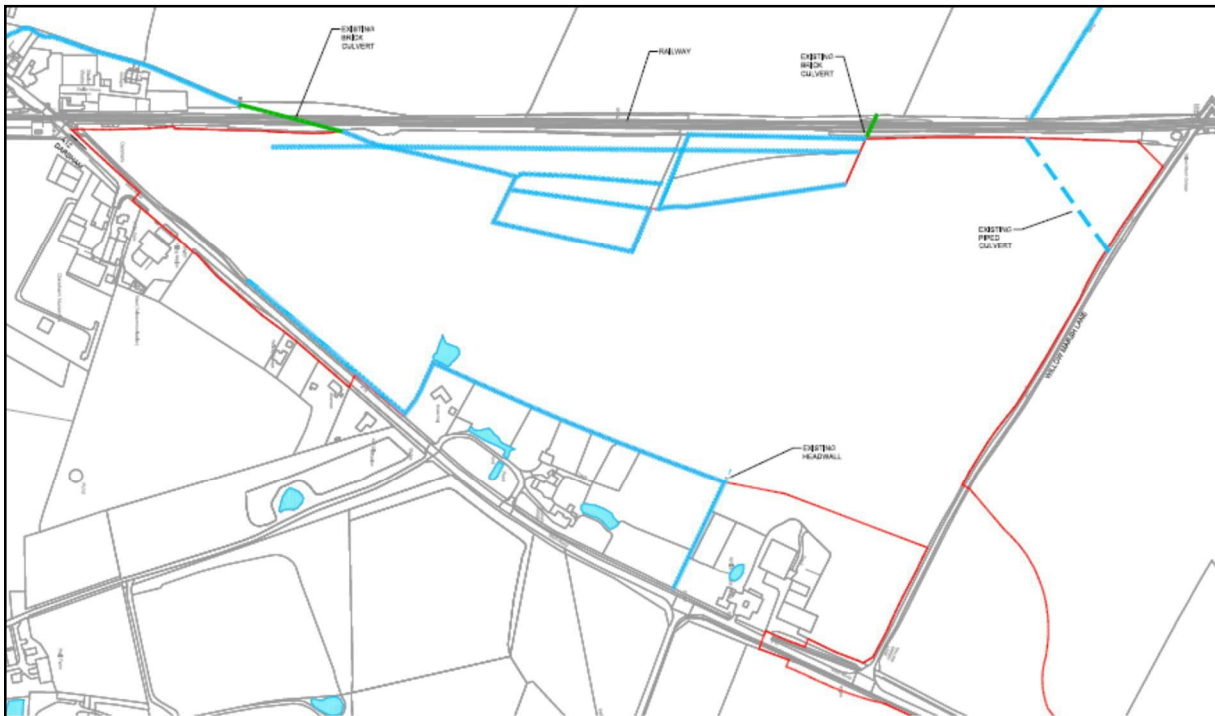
Northern park and ride external roads layout showing concept drainage infrastructure
